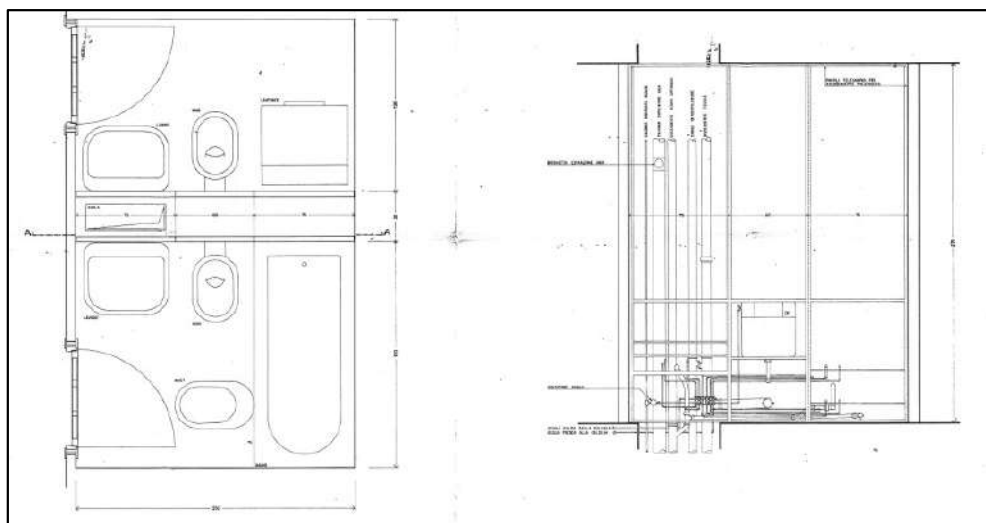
Pre-assembled bathrooms (F 163.1).
